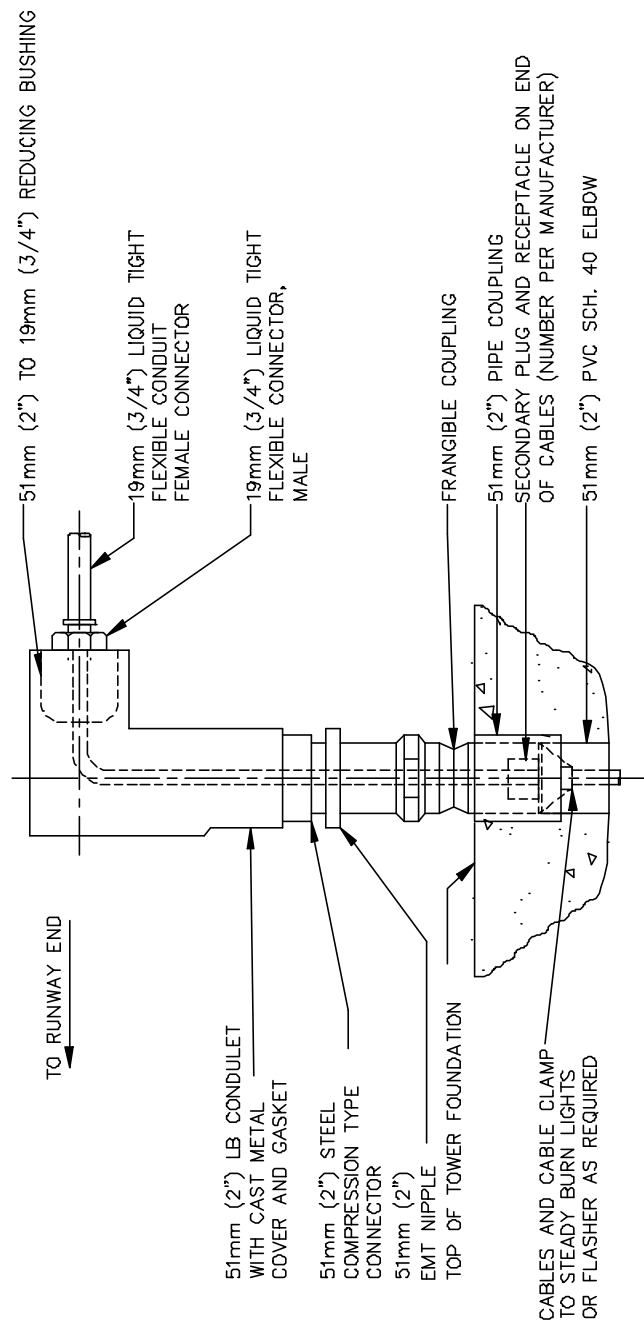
Typical MG-20 L.I.R. Structure Tower Wiring Detail
